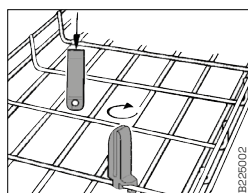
is used for mounting of Separating Plate B36 onto Mesh tray.
